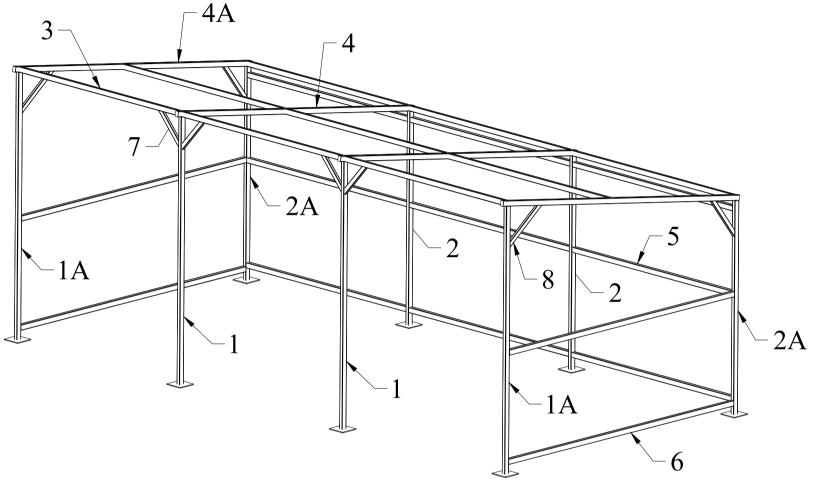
Sketch of Trussed Frame Shelter Size: L3.47 x W7.3 x H3m
